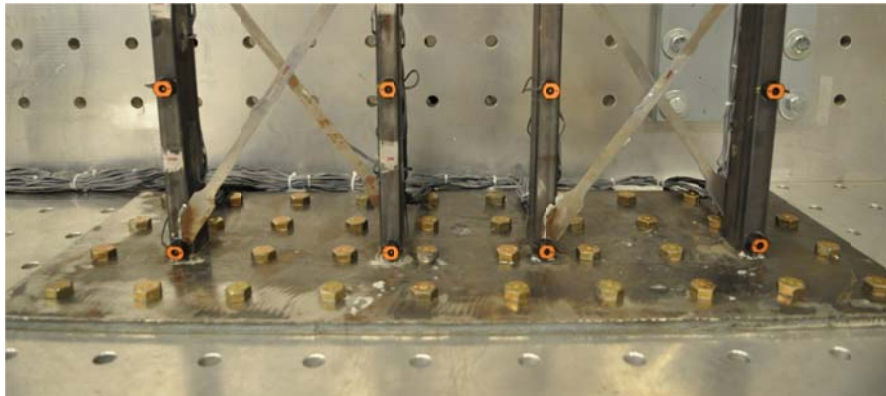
Connection of Specimen's Bottom Plate to the Strong Floor
